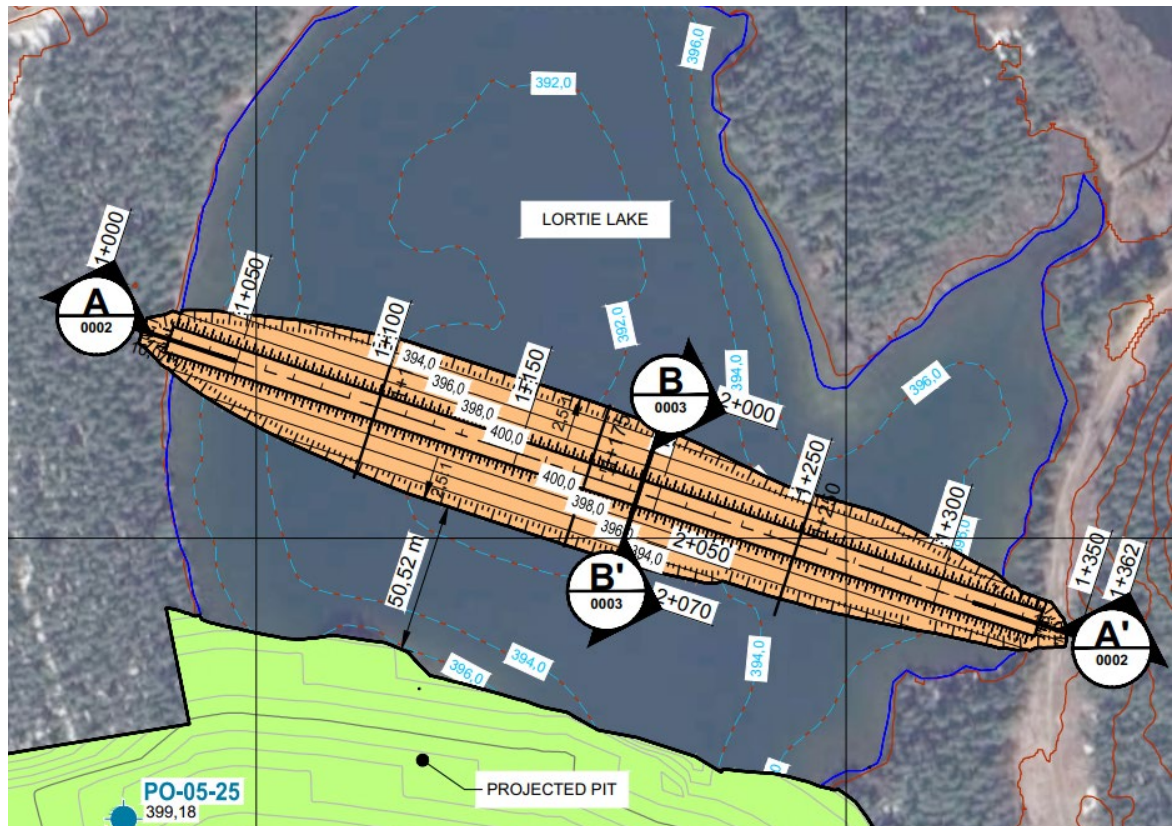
Plan view of the proposed Lortie Lake dyke
